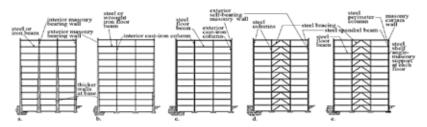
Schematic cross-sections a). Pure bearing-wall building b). Mixed bearing-wall building, c). Wall-braced cage building, d). Frame-braced cage building, e). Skeleton frame building (Modified from source: Friedman, D. 2012).
